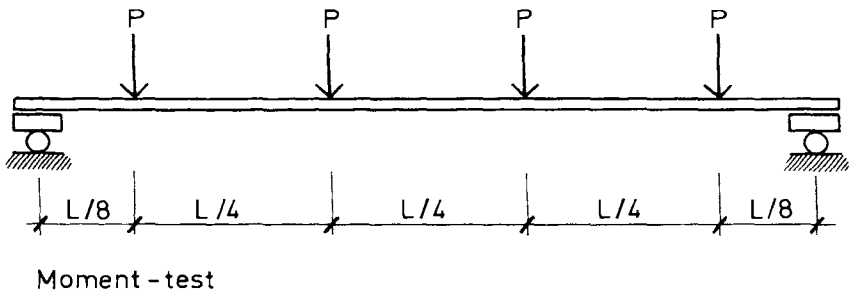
TESTING ARRANGEMENT FOR STEEL SHEETS .
